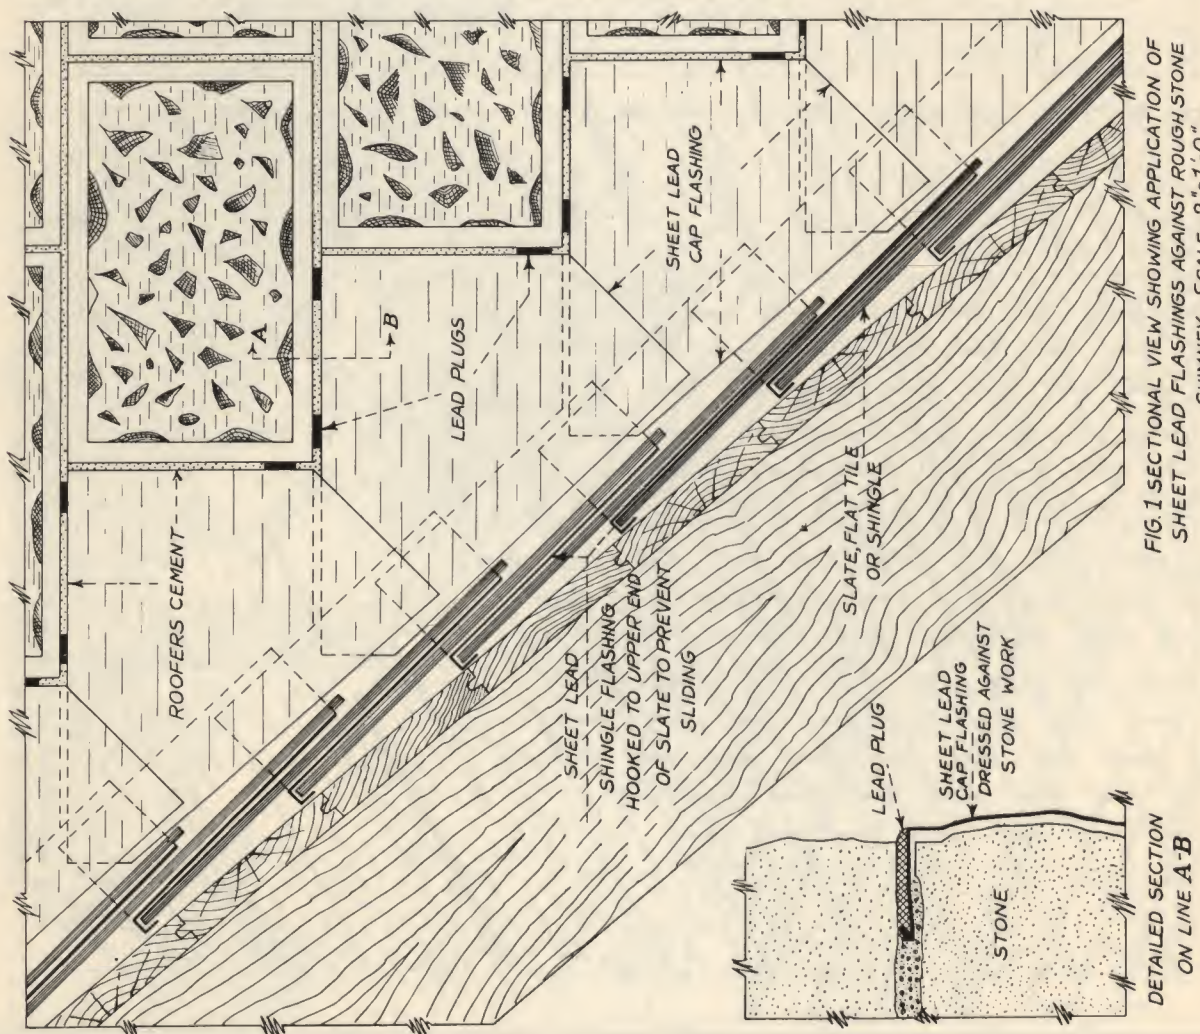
SECTIONAL VIEW SHOWING APPLICATION OF SHEET LEAD FLASHINGS AGAINST ROUGH STONE CHIMNEY - SCALE 2"=1'-0"
